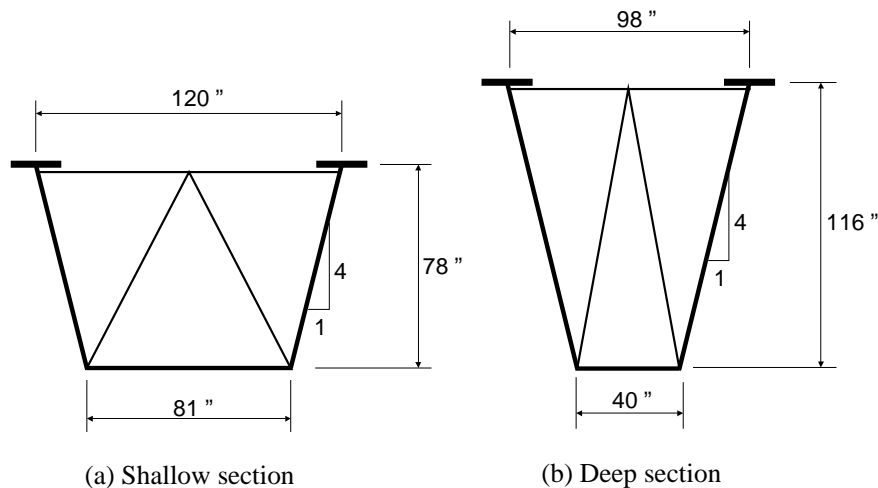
Two different cross sections of box girders with internal K-frames
